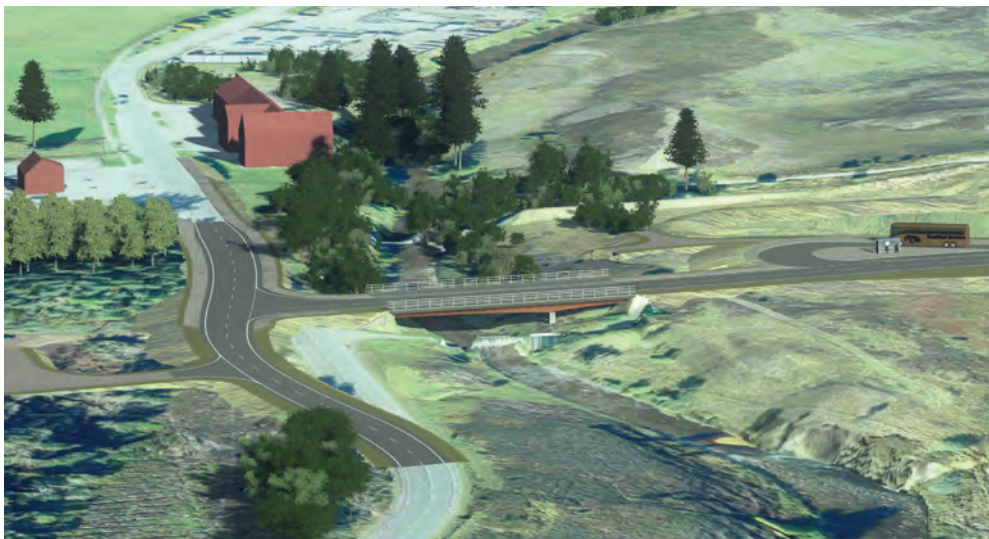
Proposed River Truim bridge and bus turning area (south of Loch Ericht Hotel)
